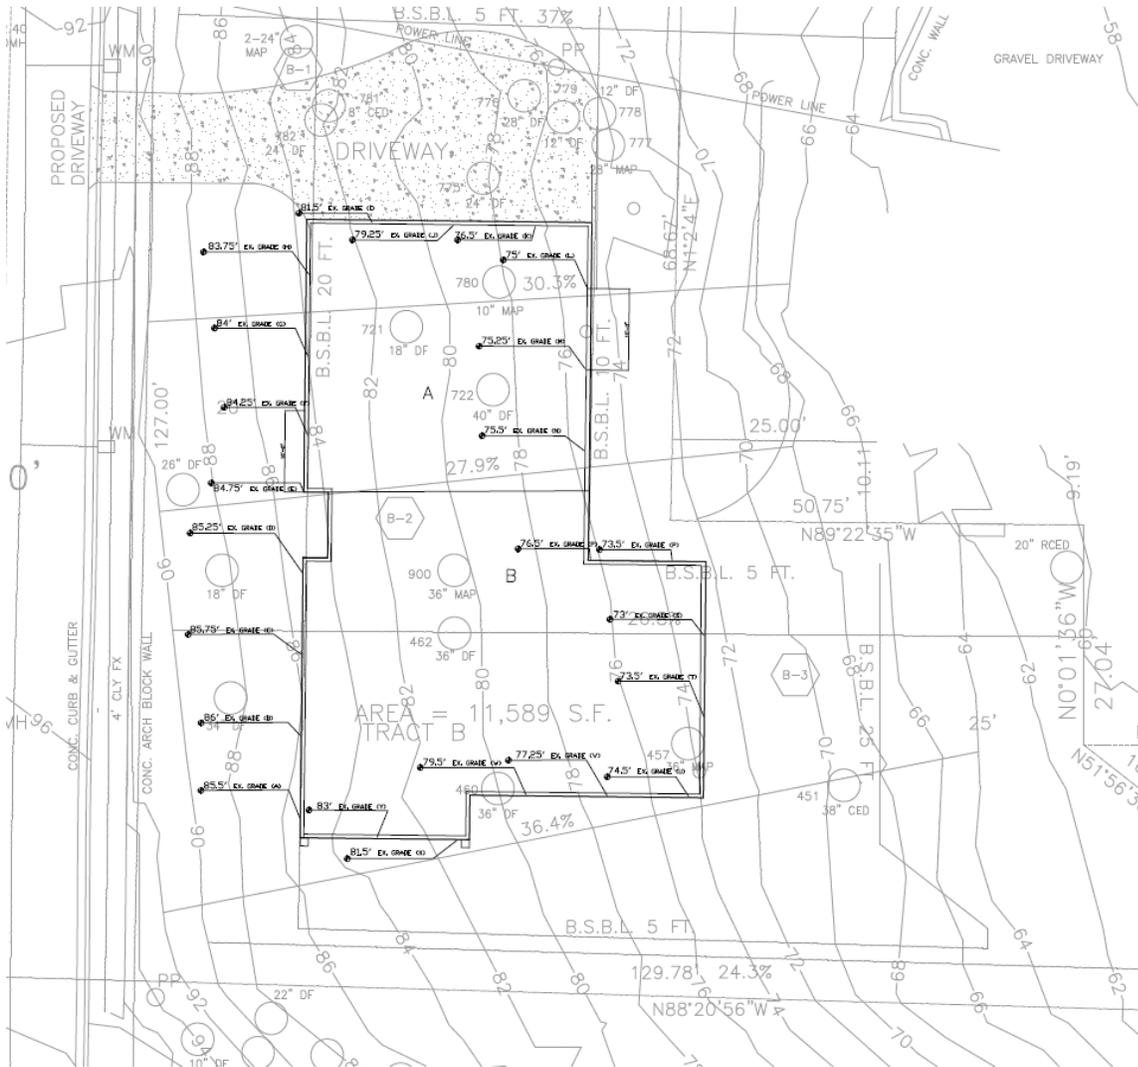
Proposed foundation and driveway plan for the Karpman home on the upper lot.
